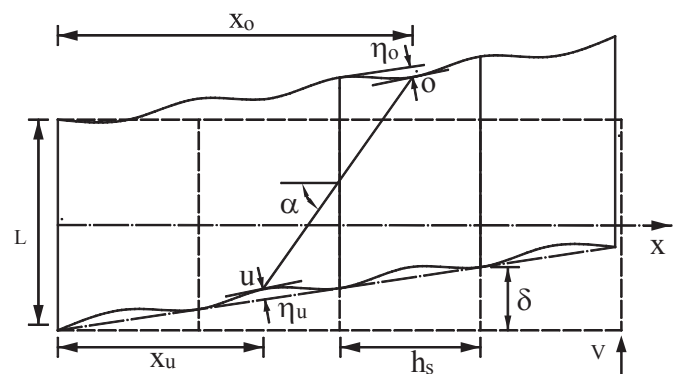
Deformation of a cantilever plate girder under transverse load (adapted from Wagner, 1931).
